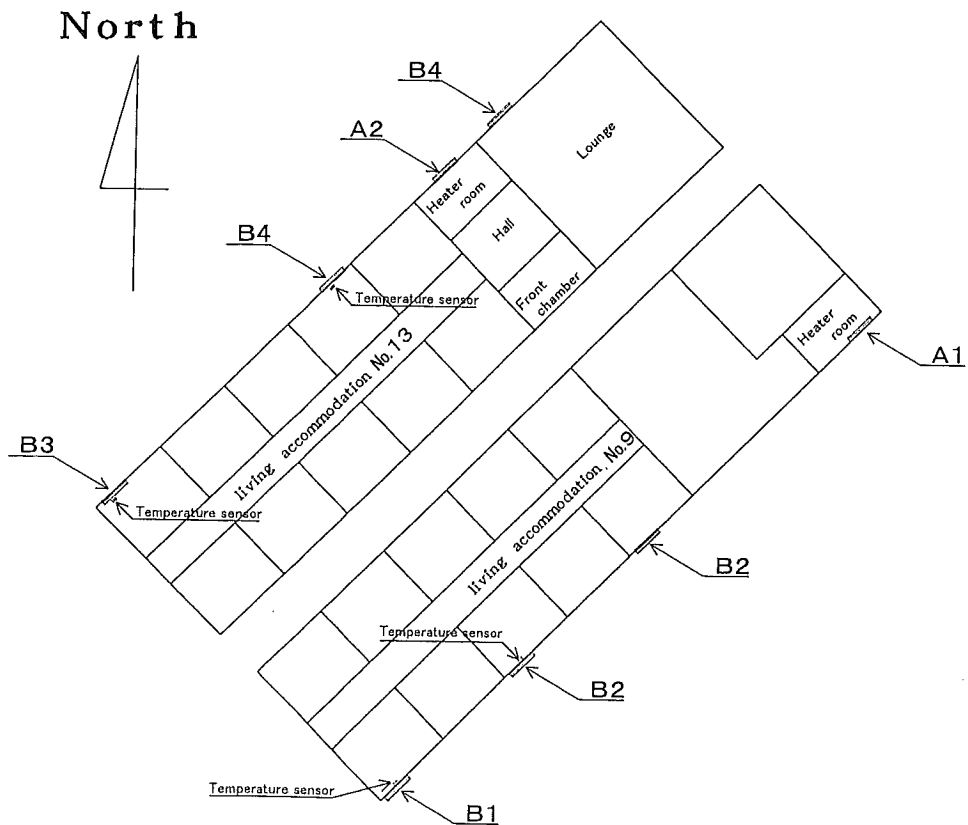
Installed position of solar collectors on the wall of living accommodations No.9 and No.13
